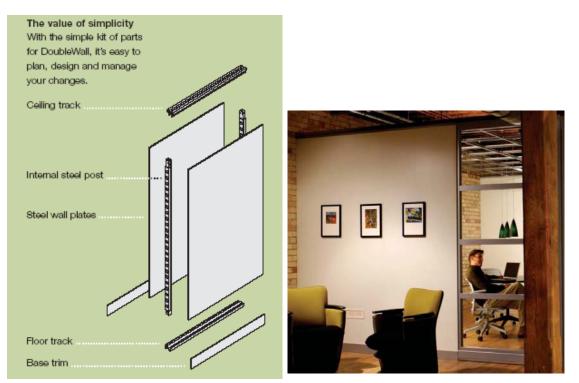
Typical commercial open-office type wall system: components (left) and finished application (right) (Steelcase)
